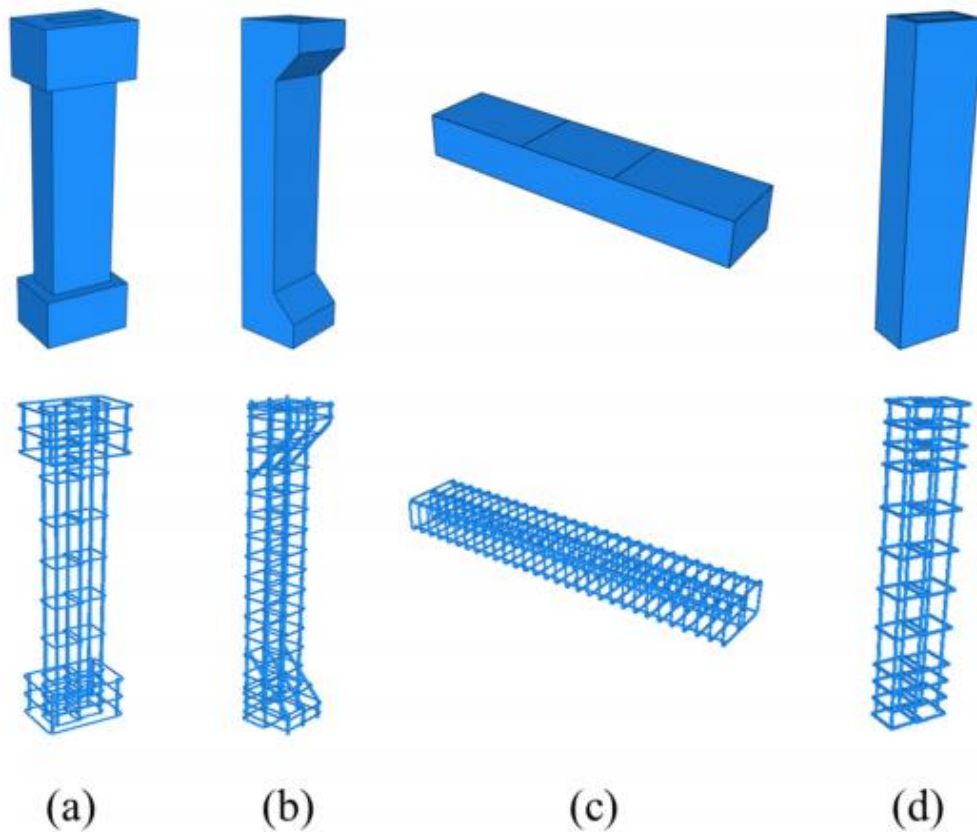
The typical geometry by Elchalakani of the FE models of, (a) concentrically loaded columns, (b) eccentrically loaded columns, (c) GPC and OPC concrete beams (d), OPC concrete columns [50].
